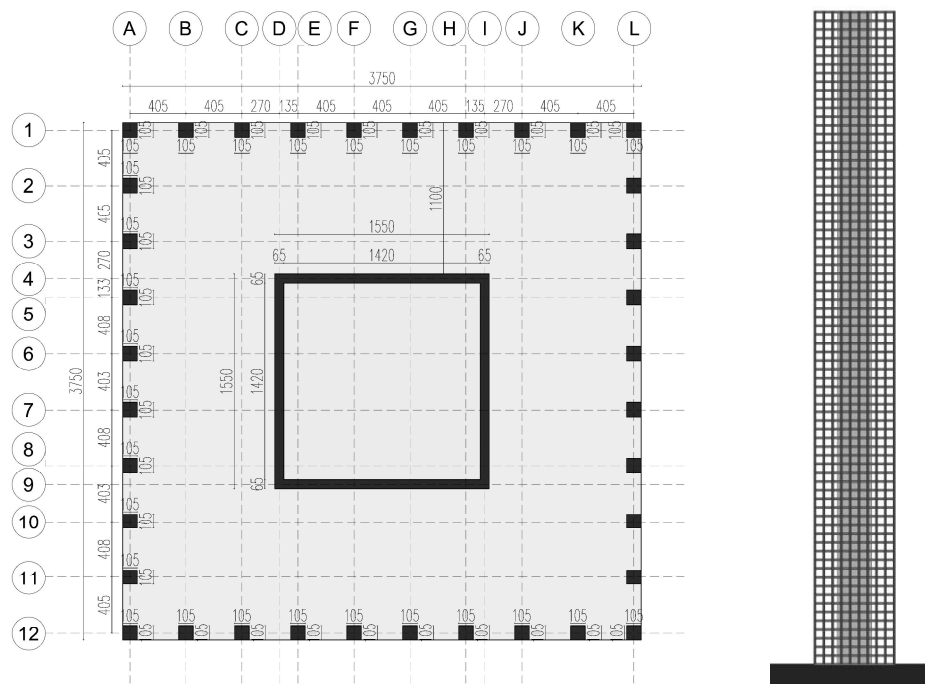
Typical floor plan (left) and elevation (right) of "reduced core building" with framed-tube system
